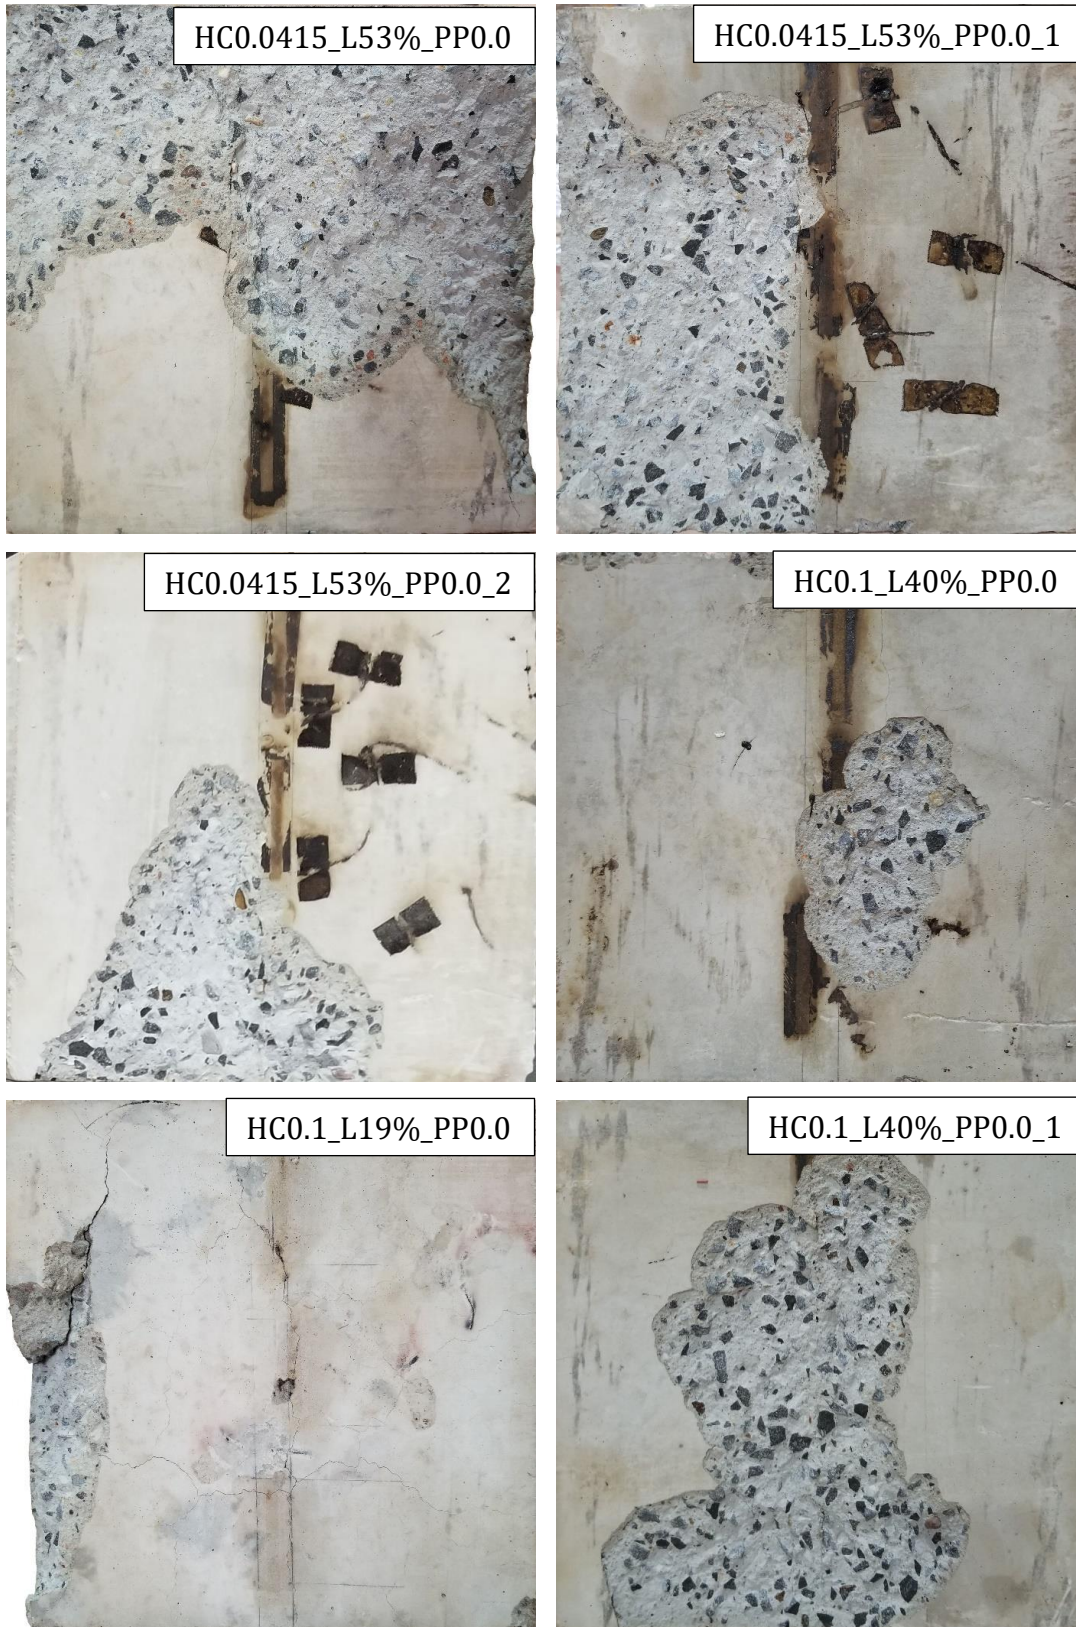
View of the front faces of spalled concrete samples after testing
